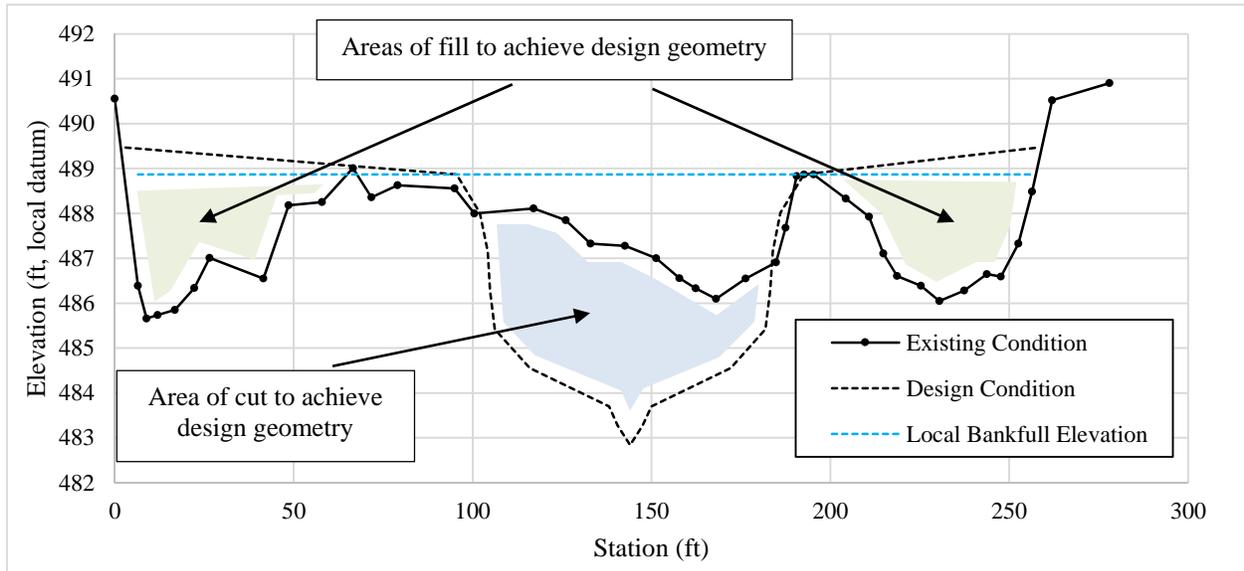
Example existing and design channel geometry from Big Wood River downstream of Deer Creek Site.
